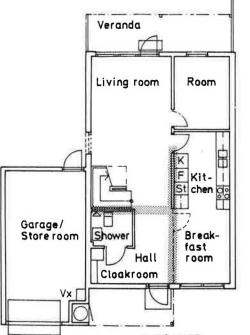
The first building in which the new steel sill system was used in a new construction was an experimental building in Sigtuna, where new building components and other factors were studied (ref. 2).
